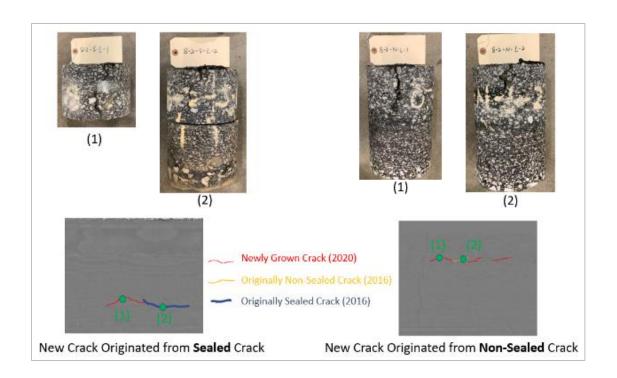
Photo. New Crack Originated from Sealed and Non-sealed Crack
